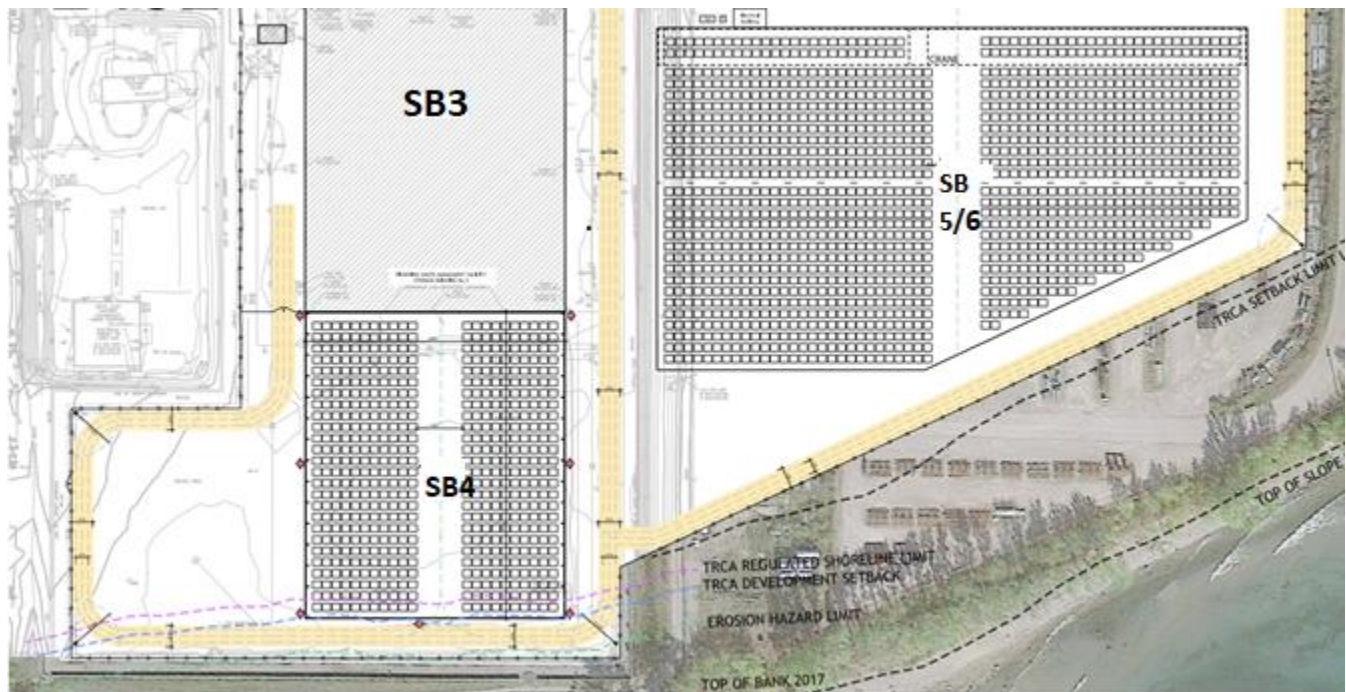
Phase II Site Plan – General Layout of Existing and Planned Buildings
